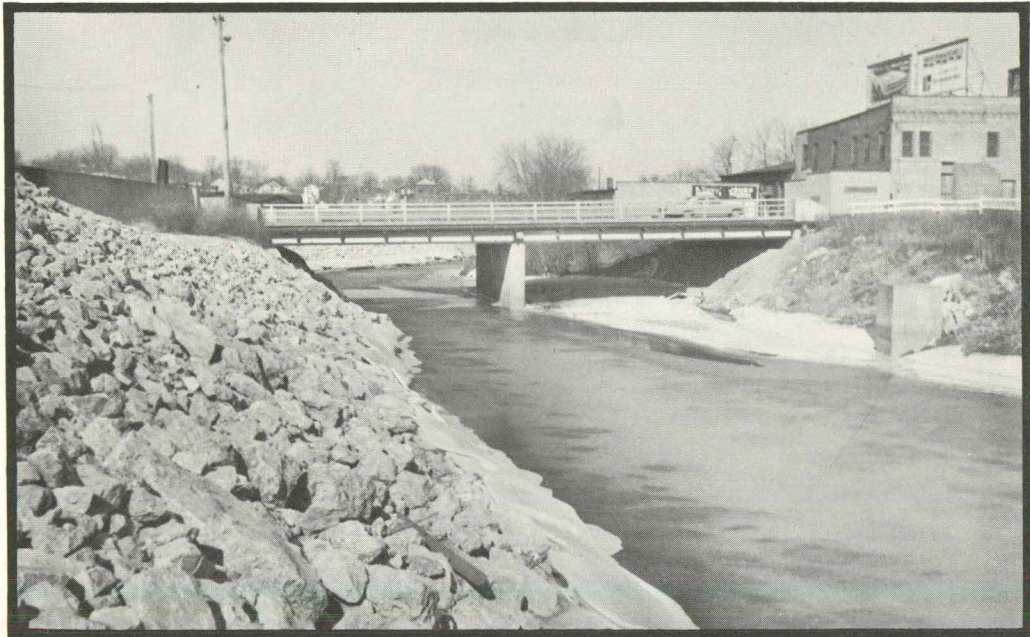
Looking upstream at the Second Street bridge over Mad Creek at Muscatine, Iowa, Sta. 16+00.
